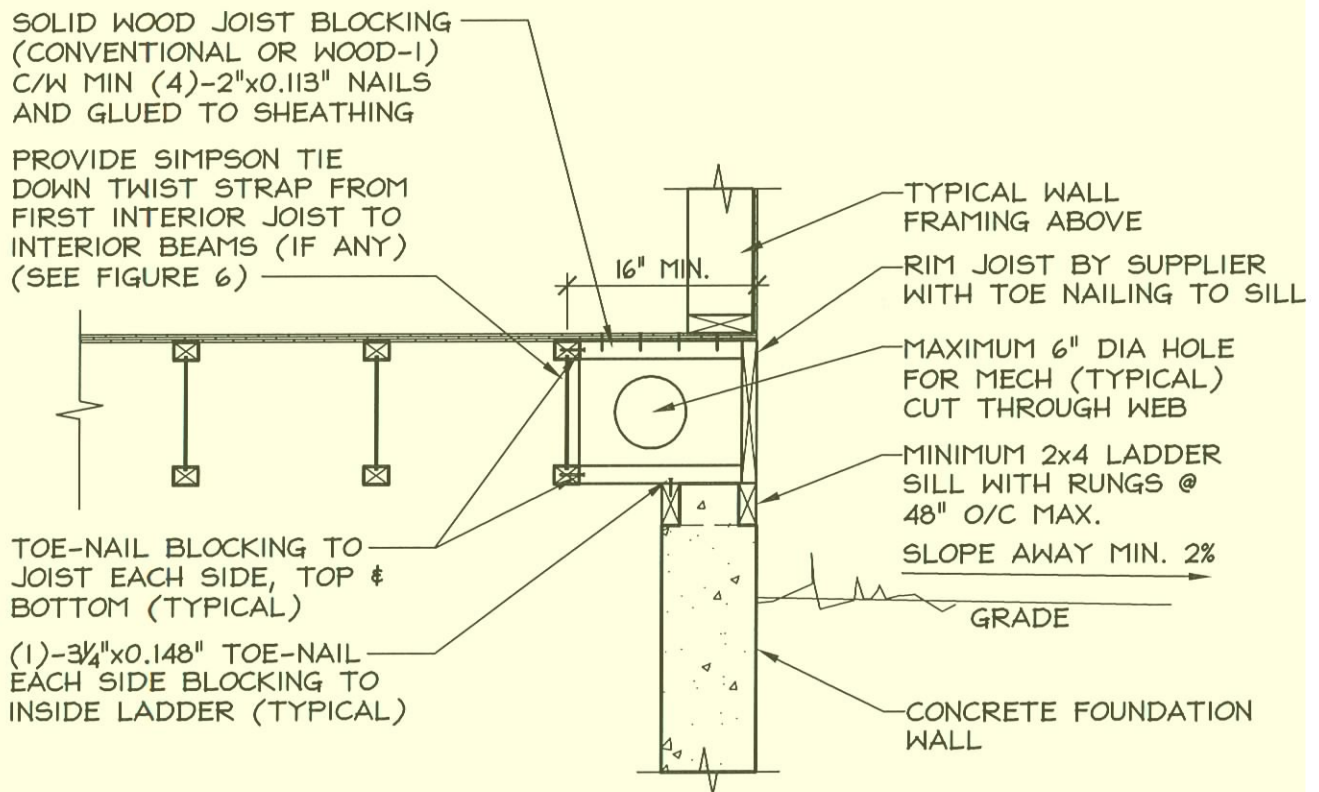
Lateral Connection TYPE 1 (Joists Parallel)
